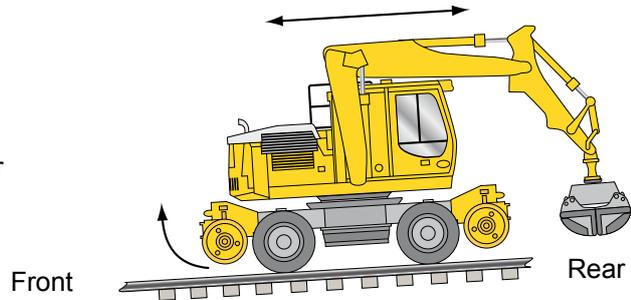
g - The machine operator believes that the rear rail wheels are now in line with the track. They are still not. The machine operator lowers the rear rail wheels onto the RRAP surface causing damage (figure 12). A gap of about 20 mm (inset) (paragraph 106) is left by the machine operator between the rear road and rail wheels (in accordance with the normal process during on-tracking).
